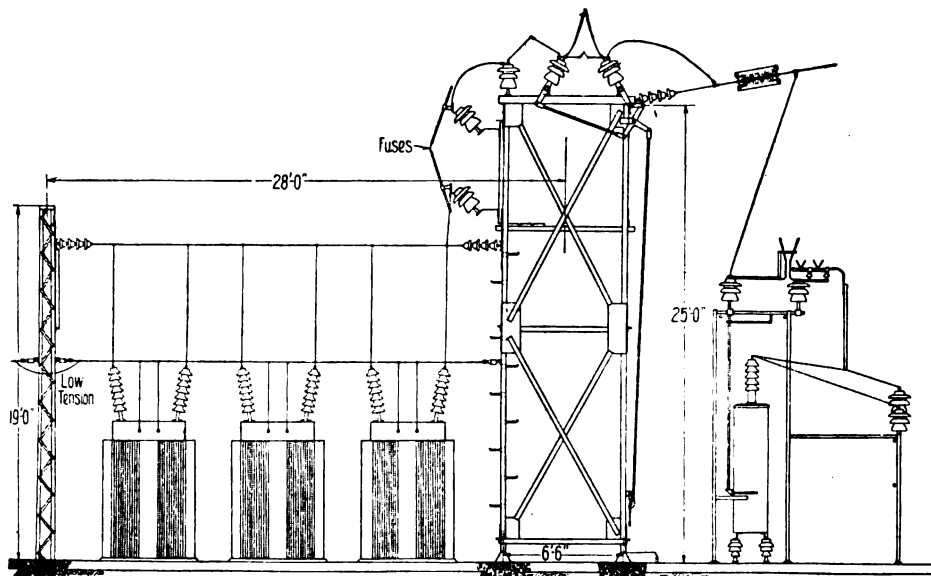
TYPICAL 73,000-VOLT OUTDOOR SUBSTATION
